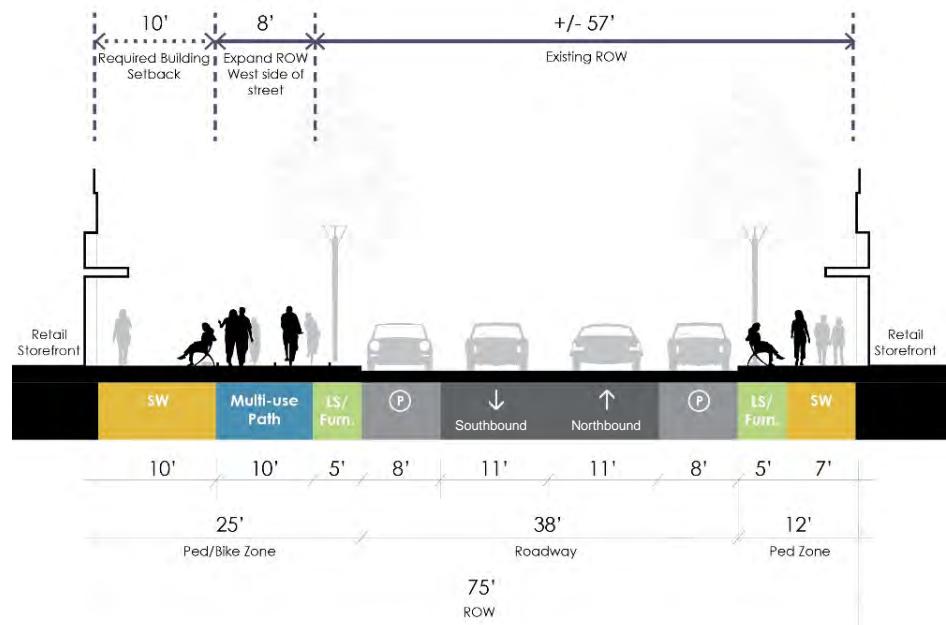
Retail Street Illustration (Main Street View Looking Northwest Between 17th Pl. NE and 18th St. NE)
